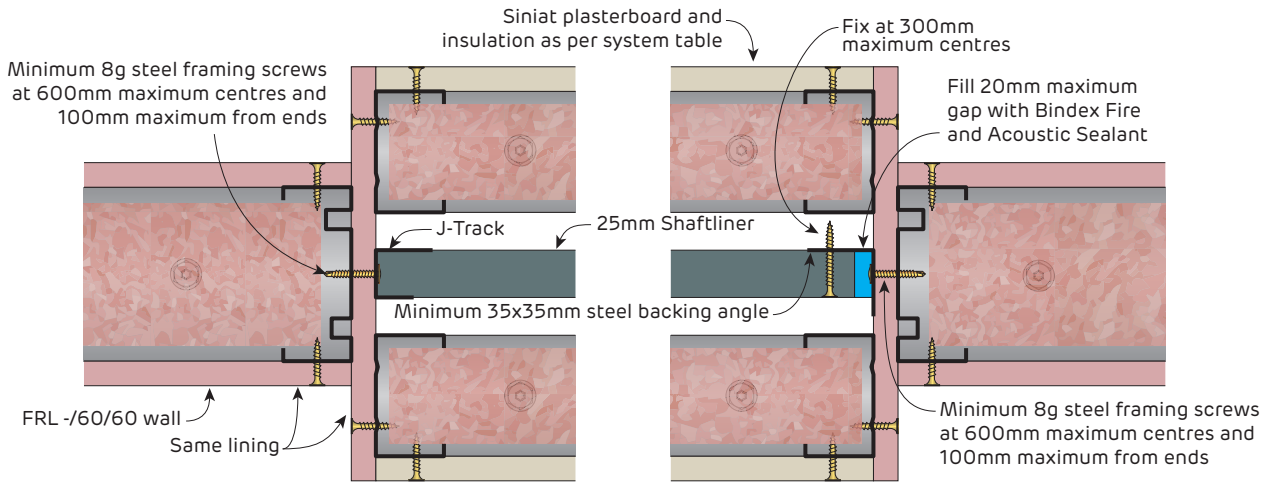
InterHome High-Rise Wall Transition to Single Stud Fire Rated Plasterboard Wall
